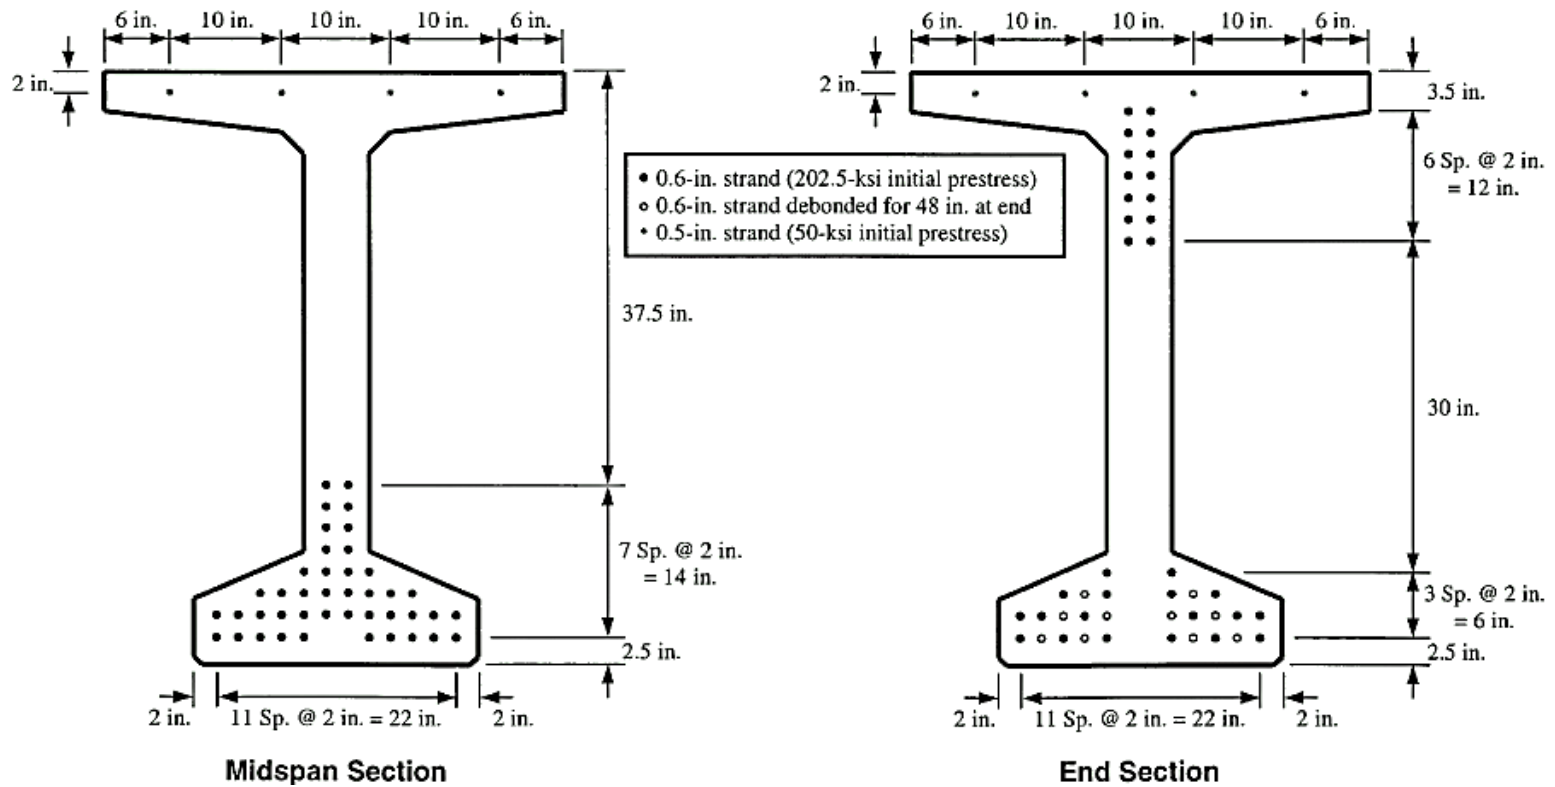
Mild Steel and Strand Arrangement at Midspan and Girder Ends (Stallings et al. 2003)
